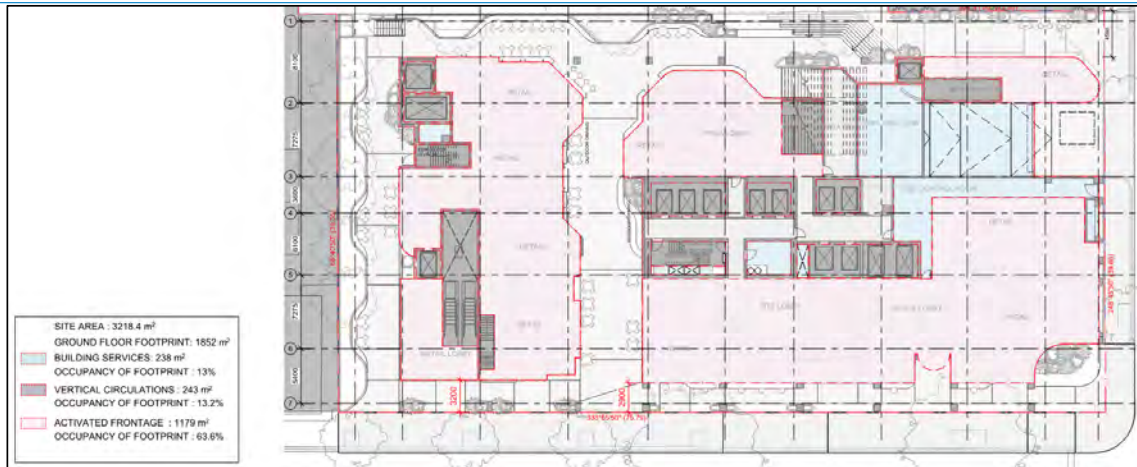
Ground floor layout illustrating extent of building services (Source: Applicant, dated September 2025)
